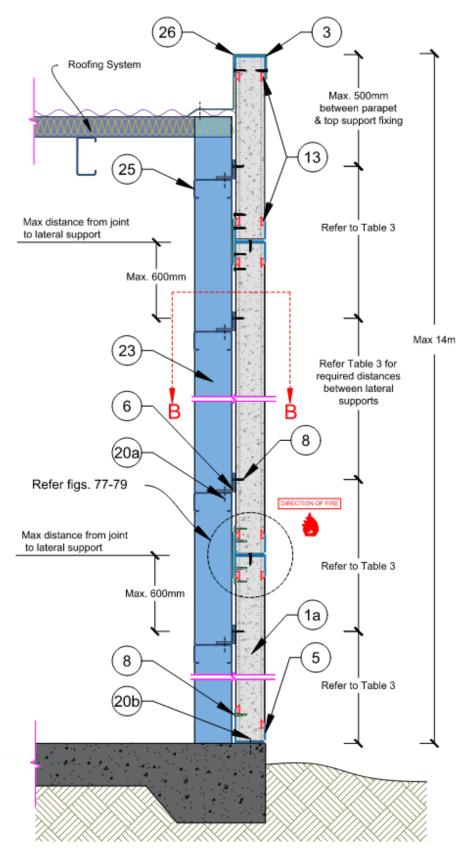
Speedpanel wall with unprotected framing at one side – C-purlin option
